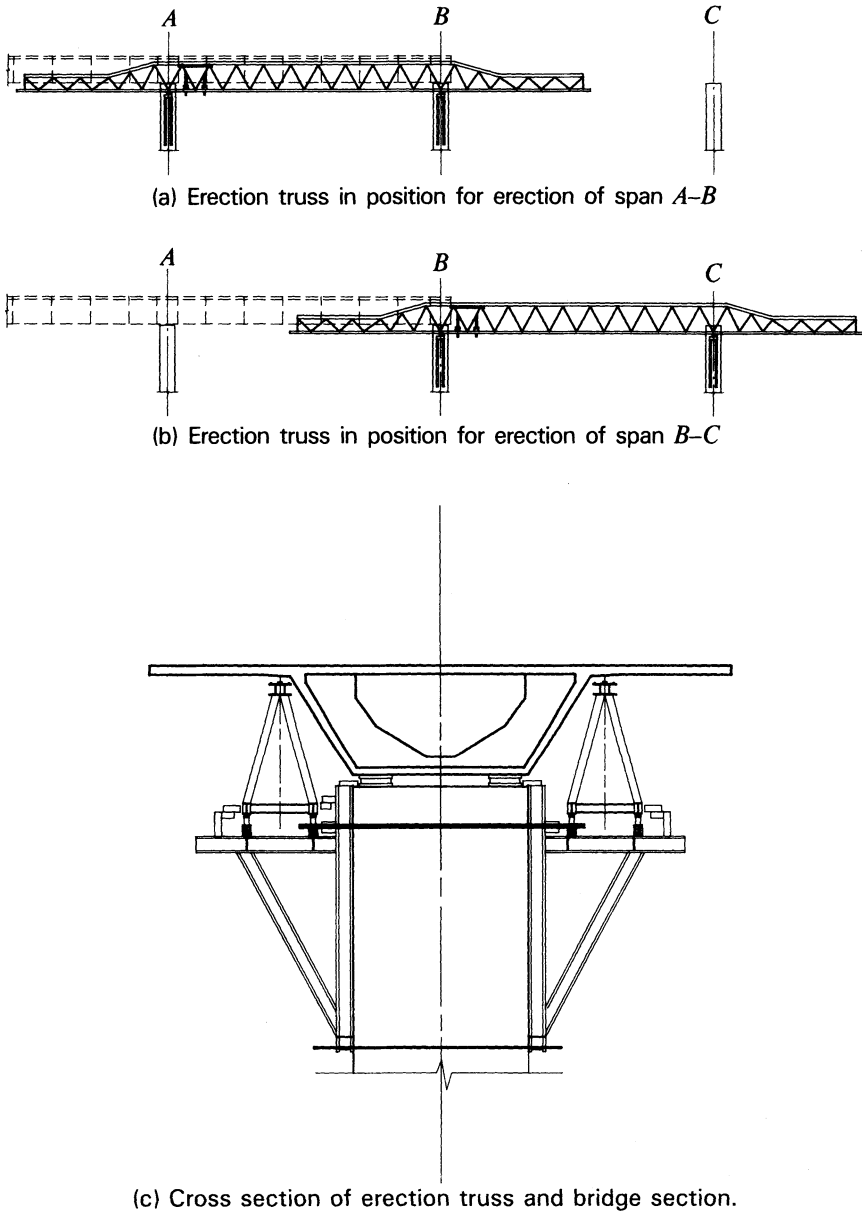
Trusses utilized with the span-by-span erection technique. (a) Erection truss in position for erecting segments in a span. (b) Erection truss advanced to next span after prestressing of previously erected span. (c) Cross section of erection truss and bridge section.
